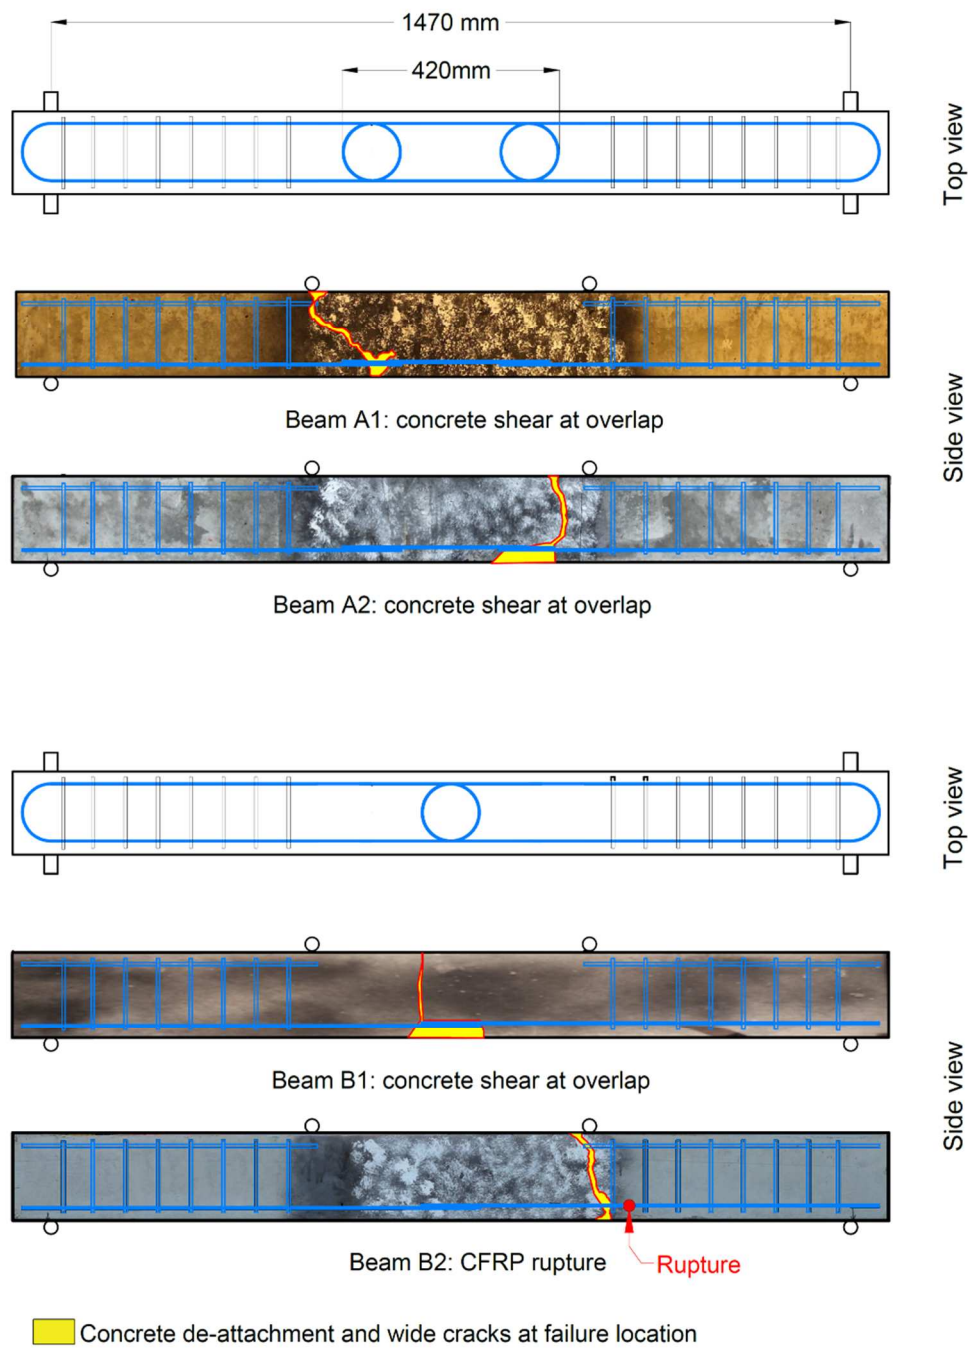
Failure zone and mechanism for beam specimens with CFRP loops at ambient temperature.
